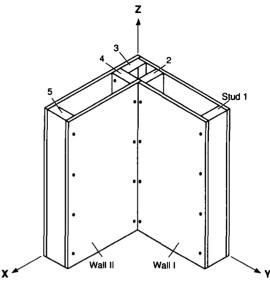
Detail of exterior-wall-to-exterior-wall connection used for testing.
